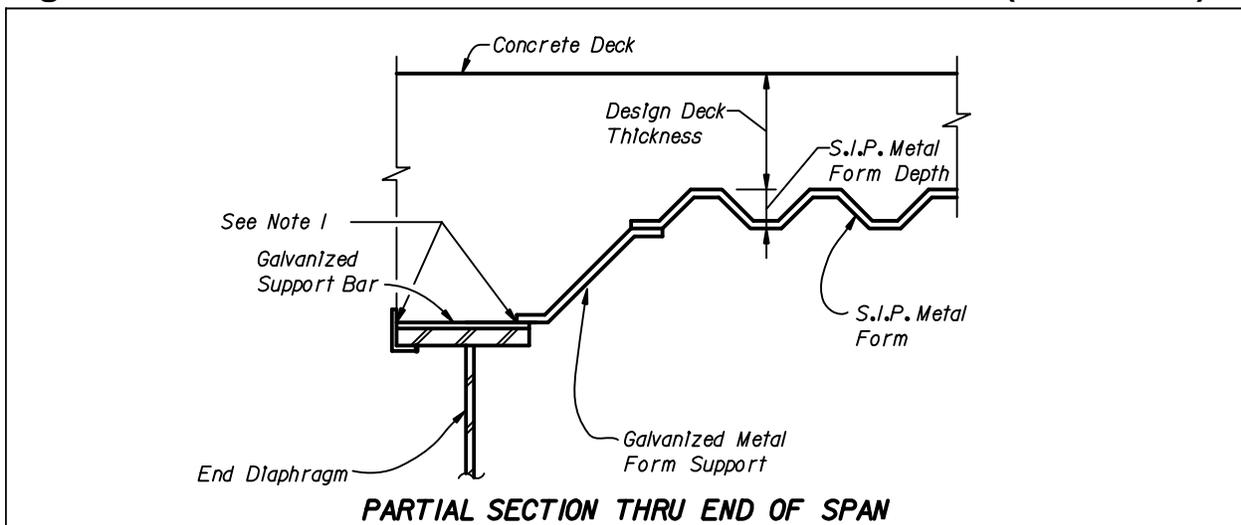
S.I.P. Form Details for Steel Box Girders (End Detail)
